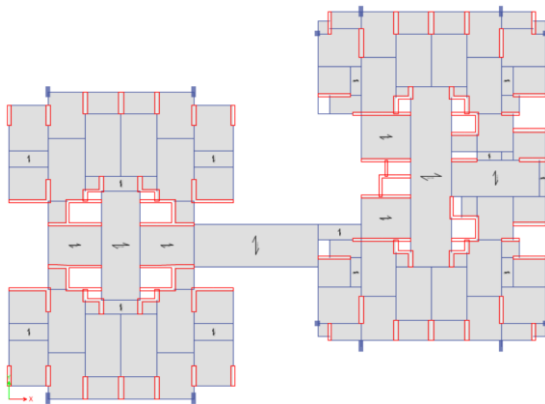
Model 2 Realistic plan with 40% height + 5% distance connection of building
